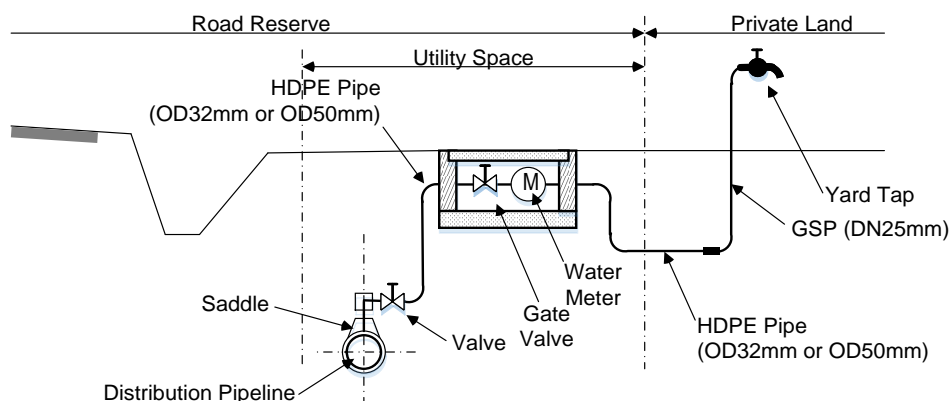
Service Pipes for Yard Tap Connection to Public Facility
